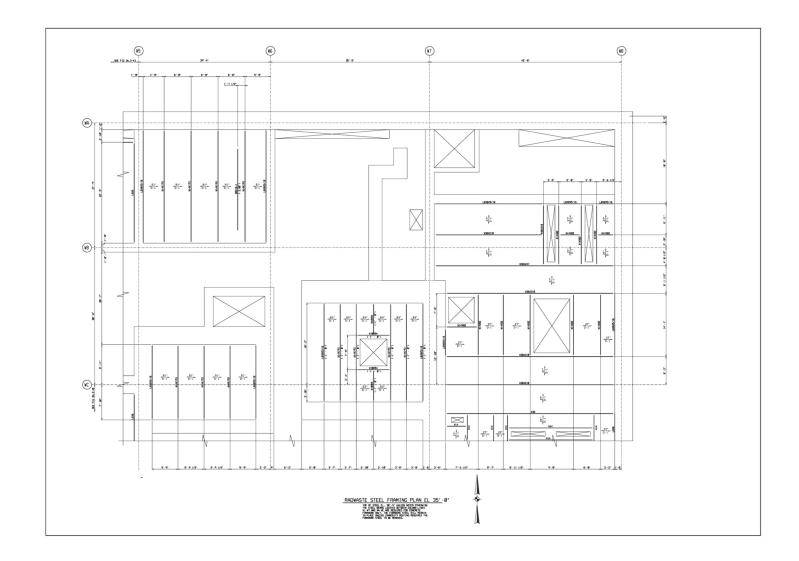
H.3-44 El 35'-0" Steel Layout Between Column Lines W5-W8 and WA-WC
